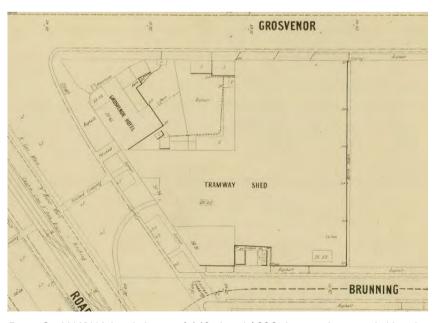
MMBW detail plan no. 1440, dated 1898 showing the extended hotel with stables and the tramway office and sheds on the adjoining land.
